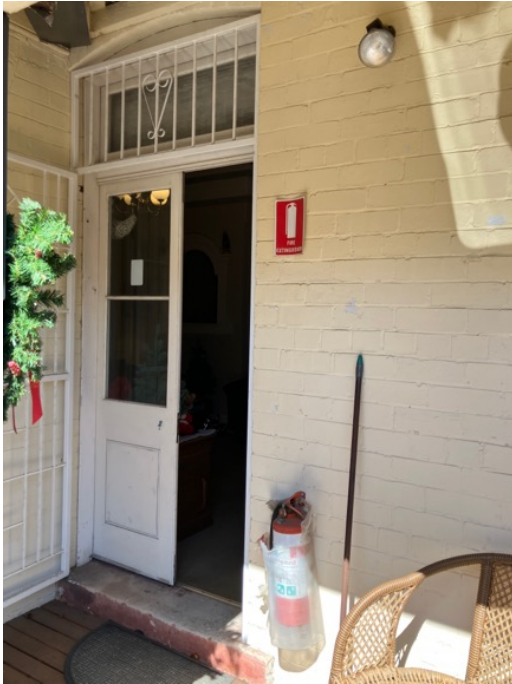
likely original external back door and fanlight to No. 37 Bydown Street.
